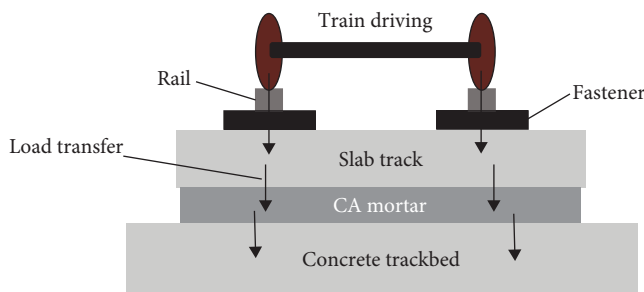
Schematic representation of layer arrangement and load transfer in the ballastless slab track system [19].
